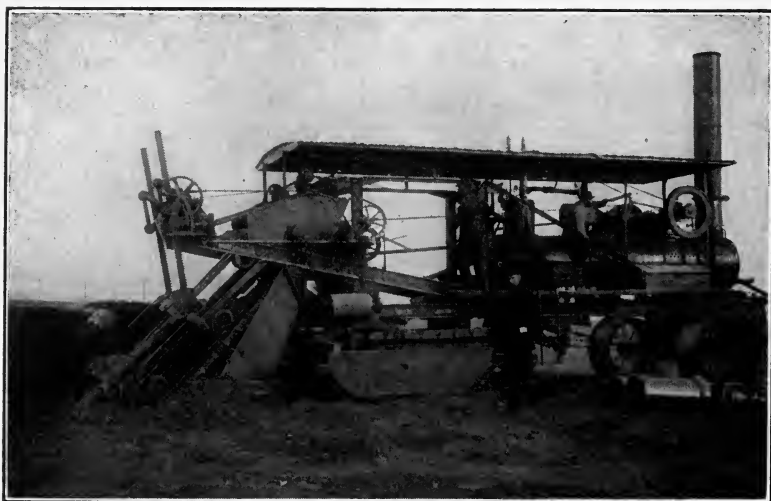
Chicago trench excavator. (Courtesy of F. C. Austin Co.)
